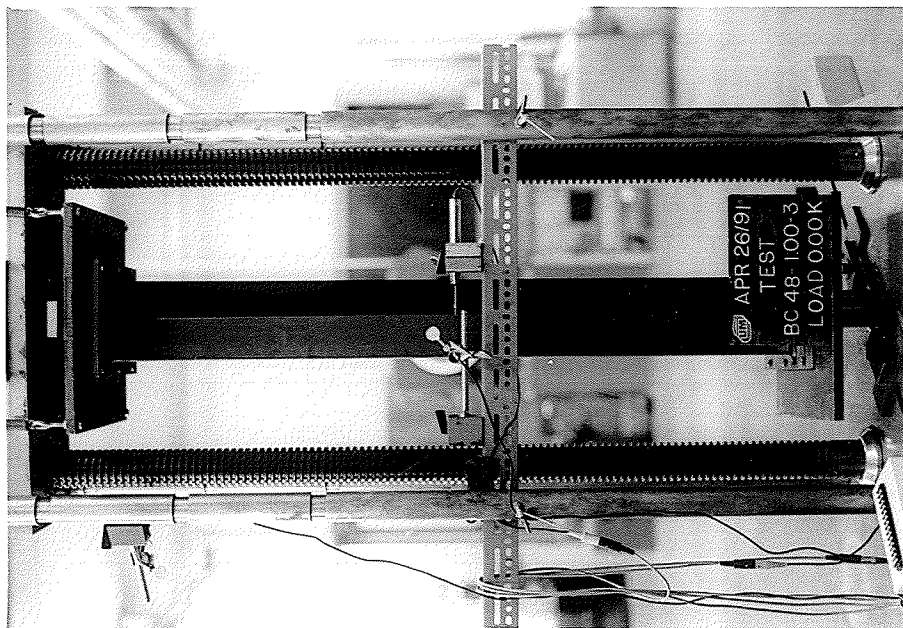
The Test Set-Up for a Typical Beam-Column Specimen
